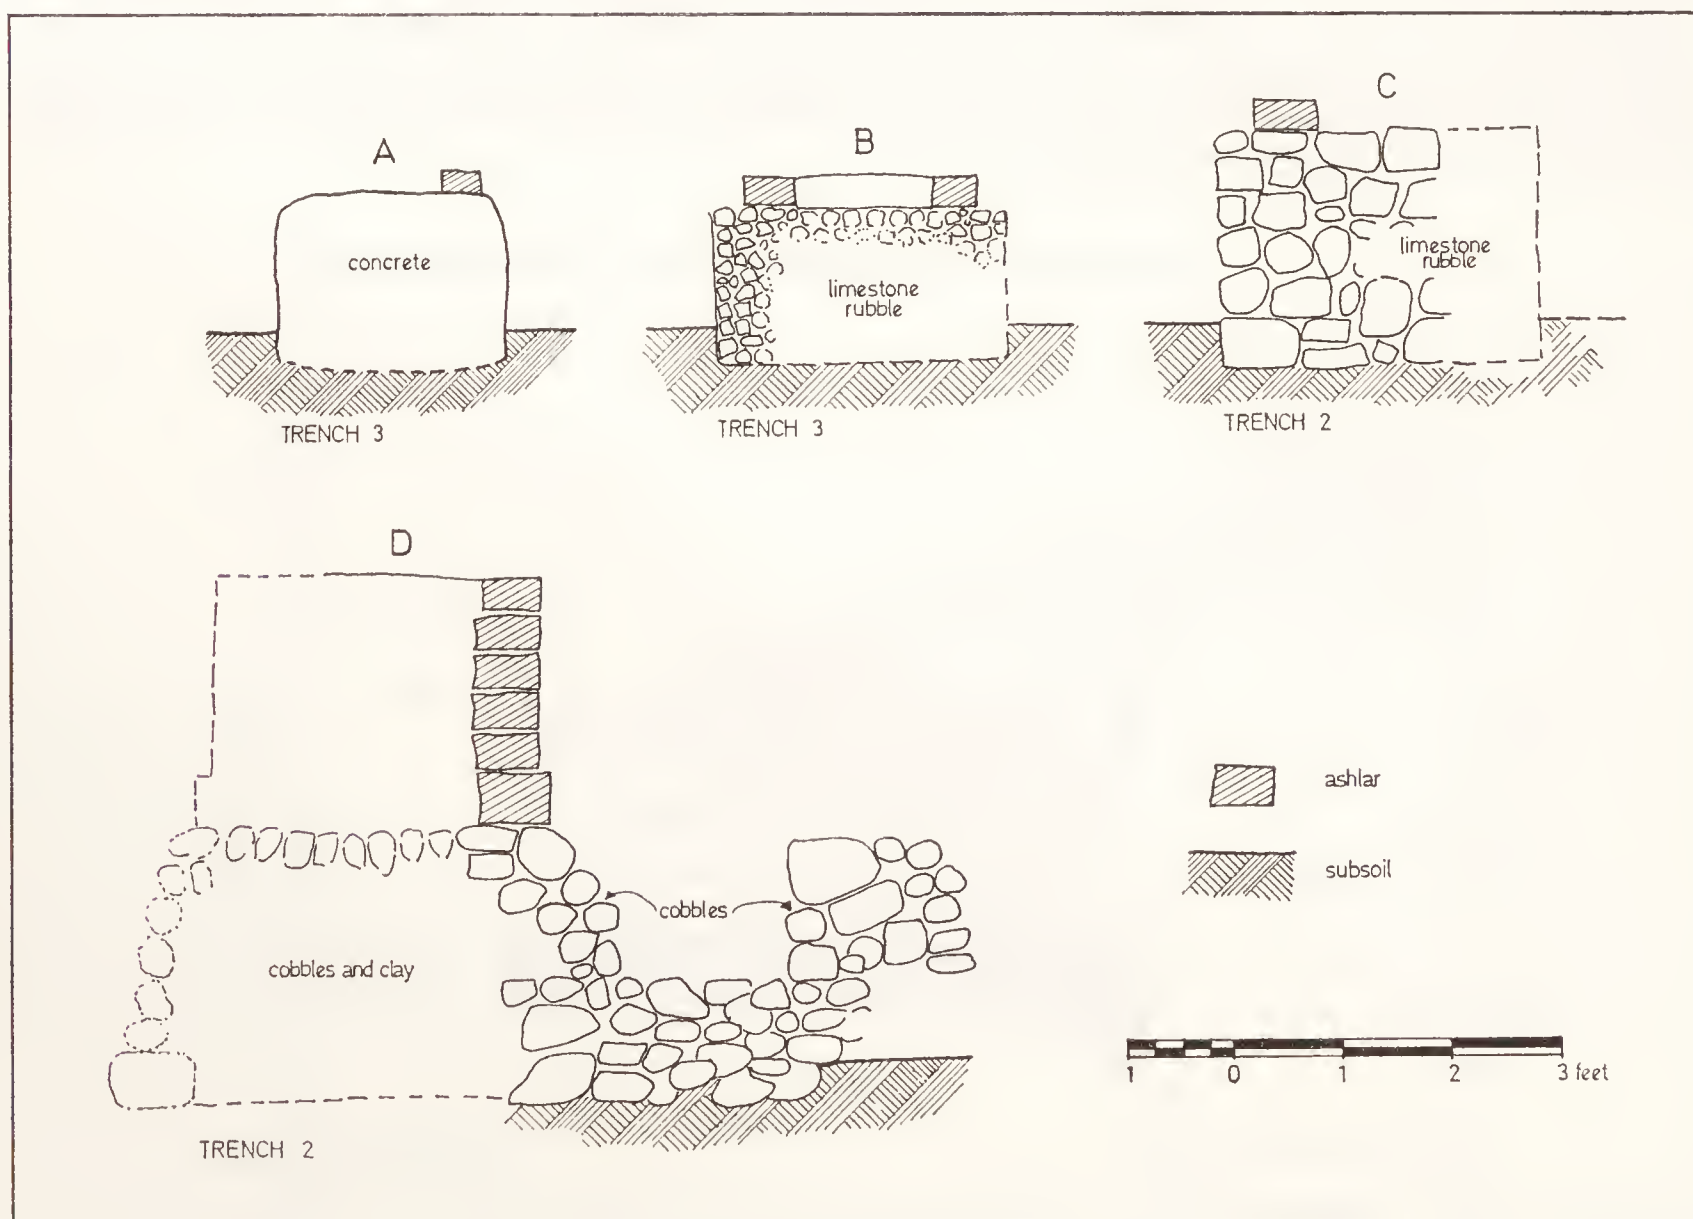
Trenches 2 and 3. Foundations of Roman walls.
